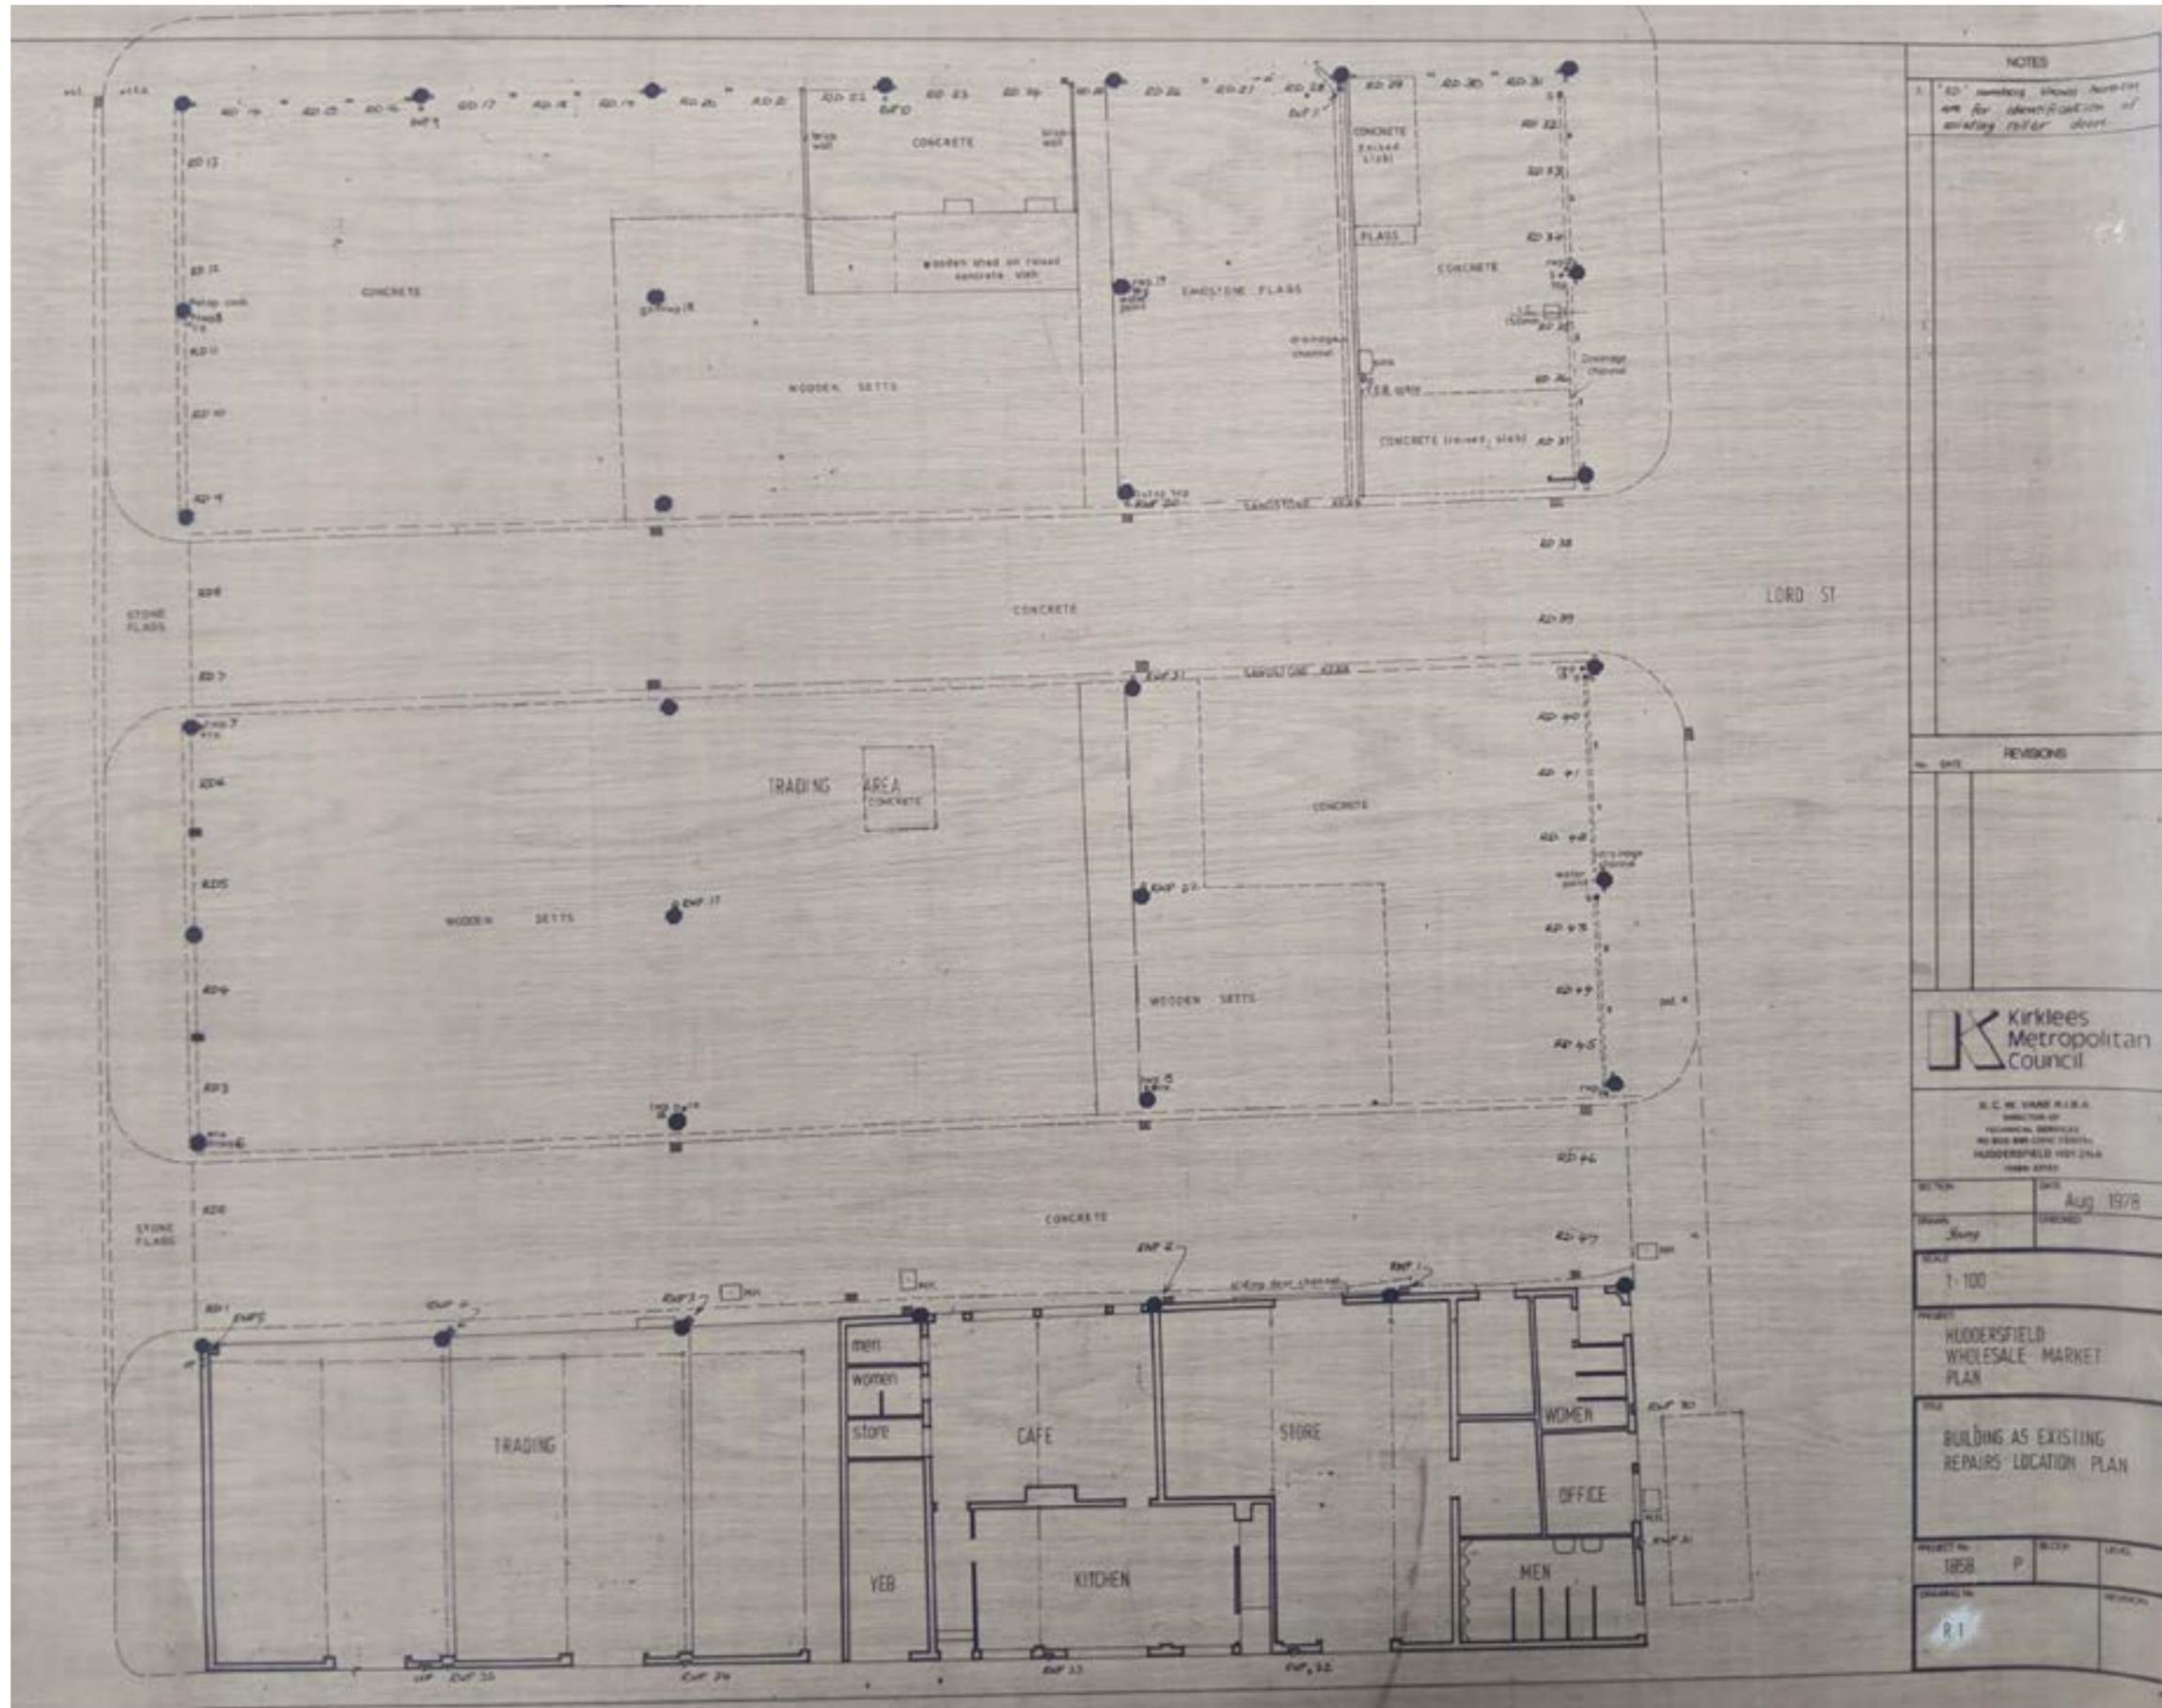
Building as Existing Repairs Location Plan 1979 © Kirklees Council
